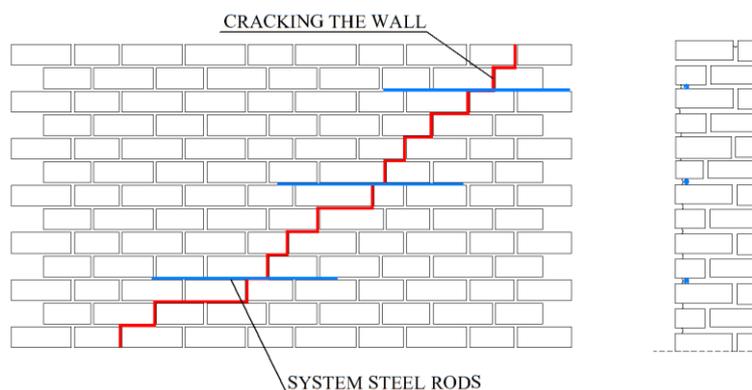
Scheme of the wall's structure repair by using system steel rods
